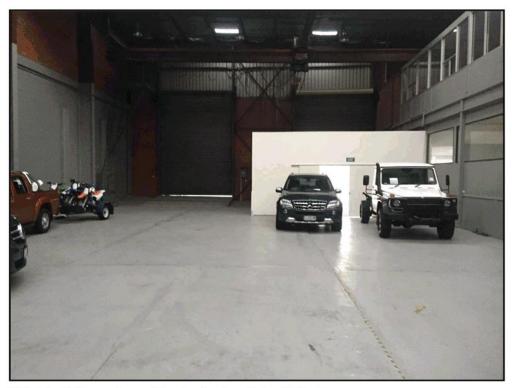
Inside the warehouse at the site, view towards Argyle Street
